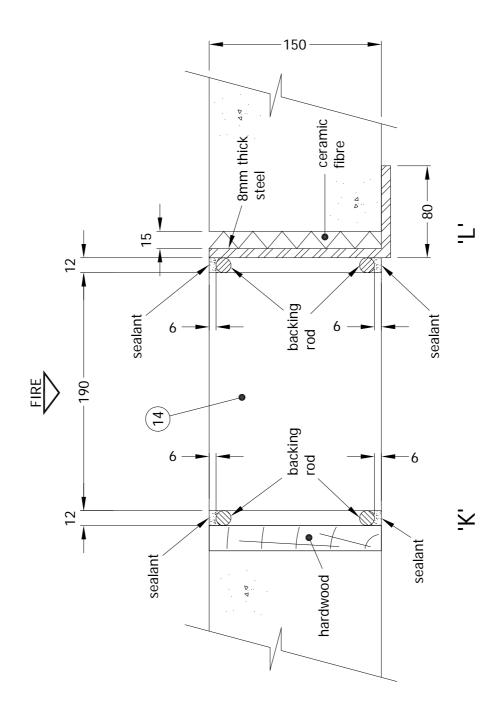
Section Through Wall Specimens 'K' and 'L' (items 11 and 12)
